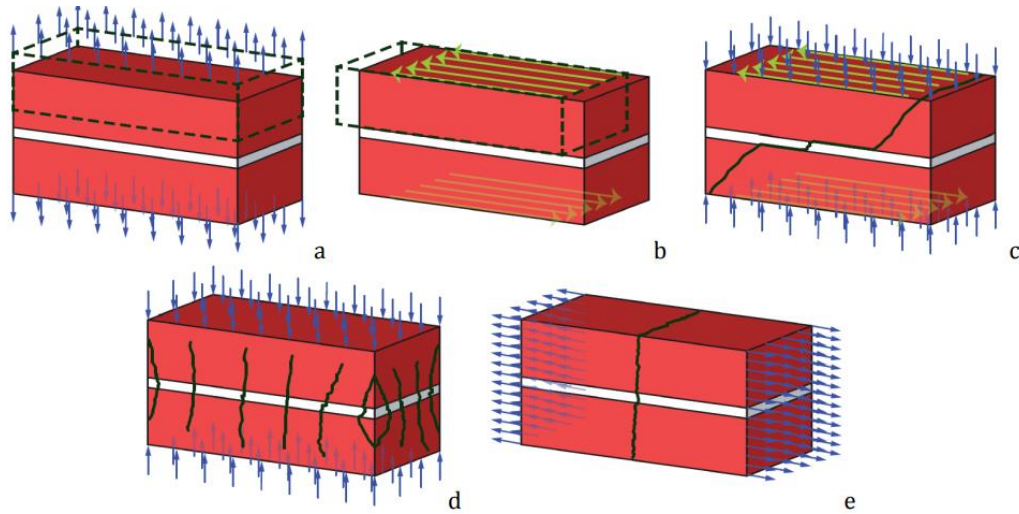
Masonry failure mechanisms (following [32]): a) brick-mortar interface tensile failure, b) brick-mortar interface shear sliding, c) diagonal masonry cracking, d) masonry crushing and e) brick and mortar tensile cracking
